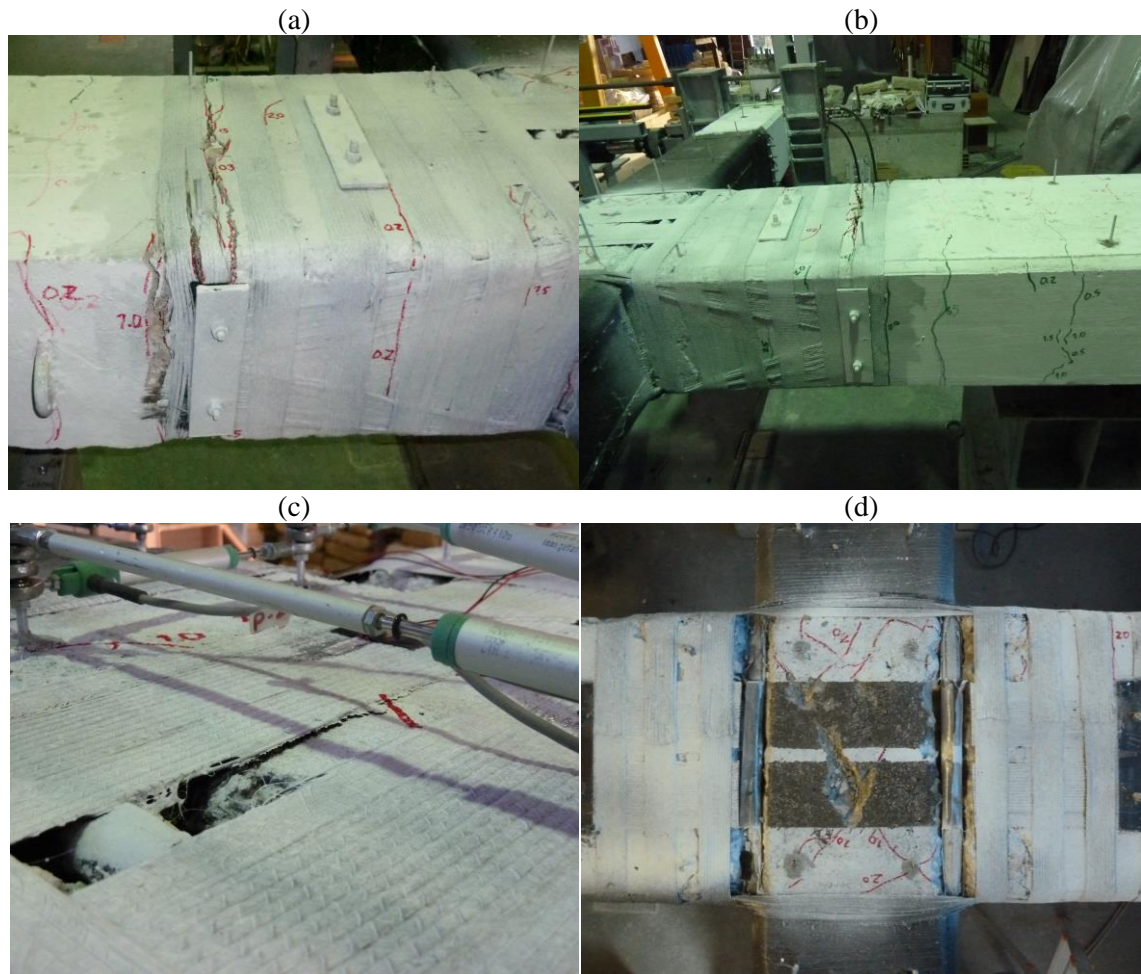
(a) Large crack opening at beam, 500 mm from the joint interface; (b) cracks along the beam bottom face; (c) slight debonding of the joint FRP at 1.5% drift; (d) after removal of FRP, diagonal cracks at the surface of the joint panel for specimen C-noSLT-RP-B.
